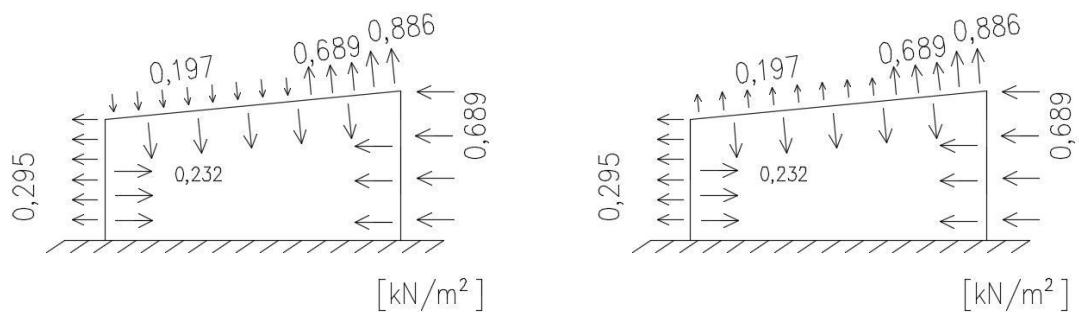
Principle sketch of transversal wind loads (X-)
